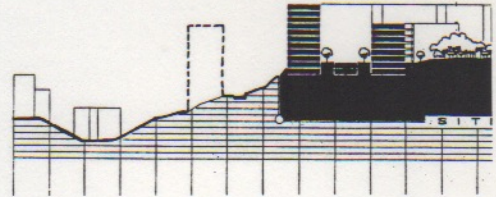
Possible affect of a new adjacent building on views from Panoramic Apartments.
